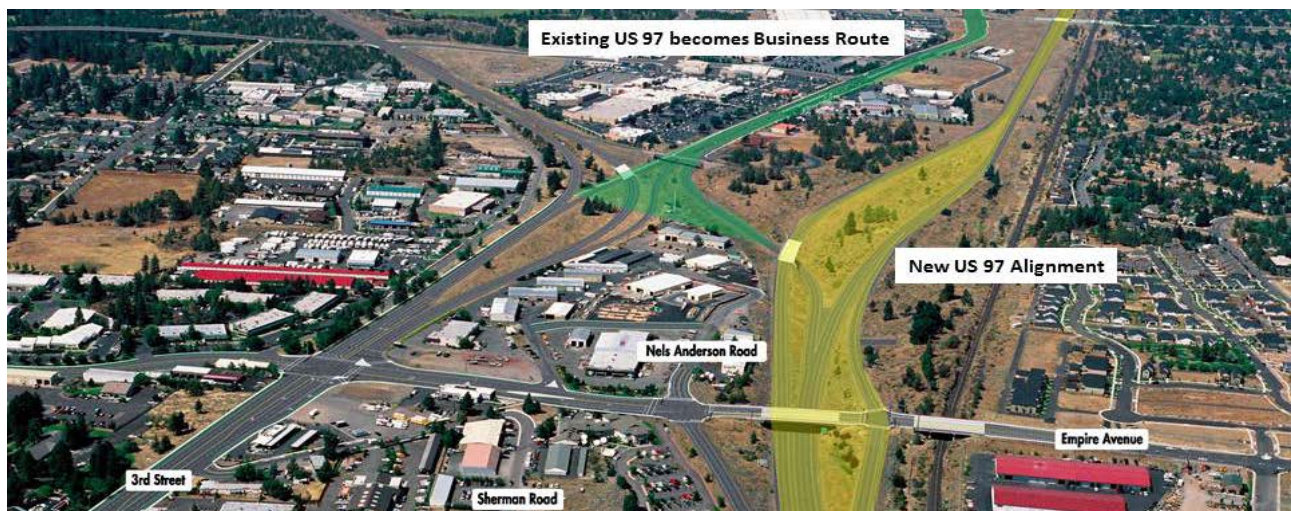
US 97 reroute will be built to the east of the existing highway. The current alignment will become a local route (3rd Street).
